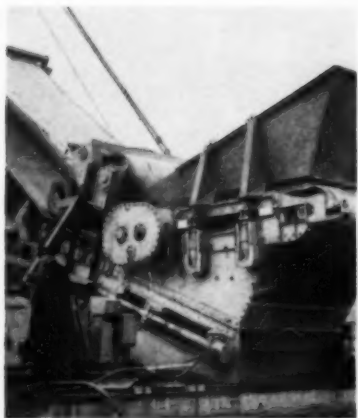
LOADING HOPPER for elevating conveyor with hugger belt.
